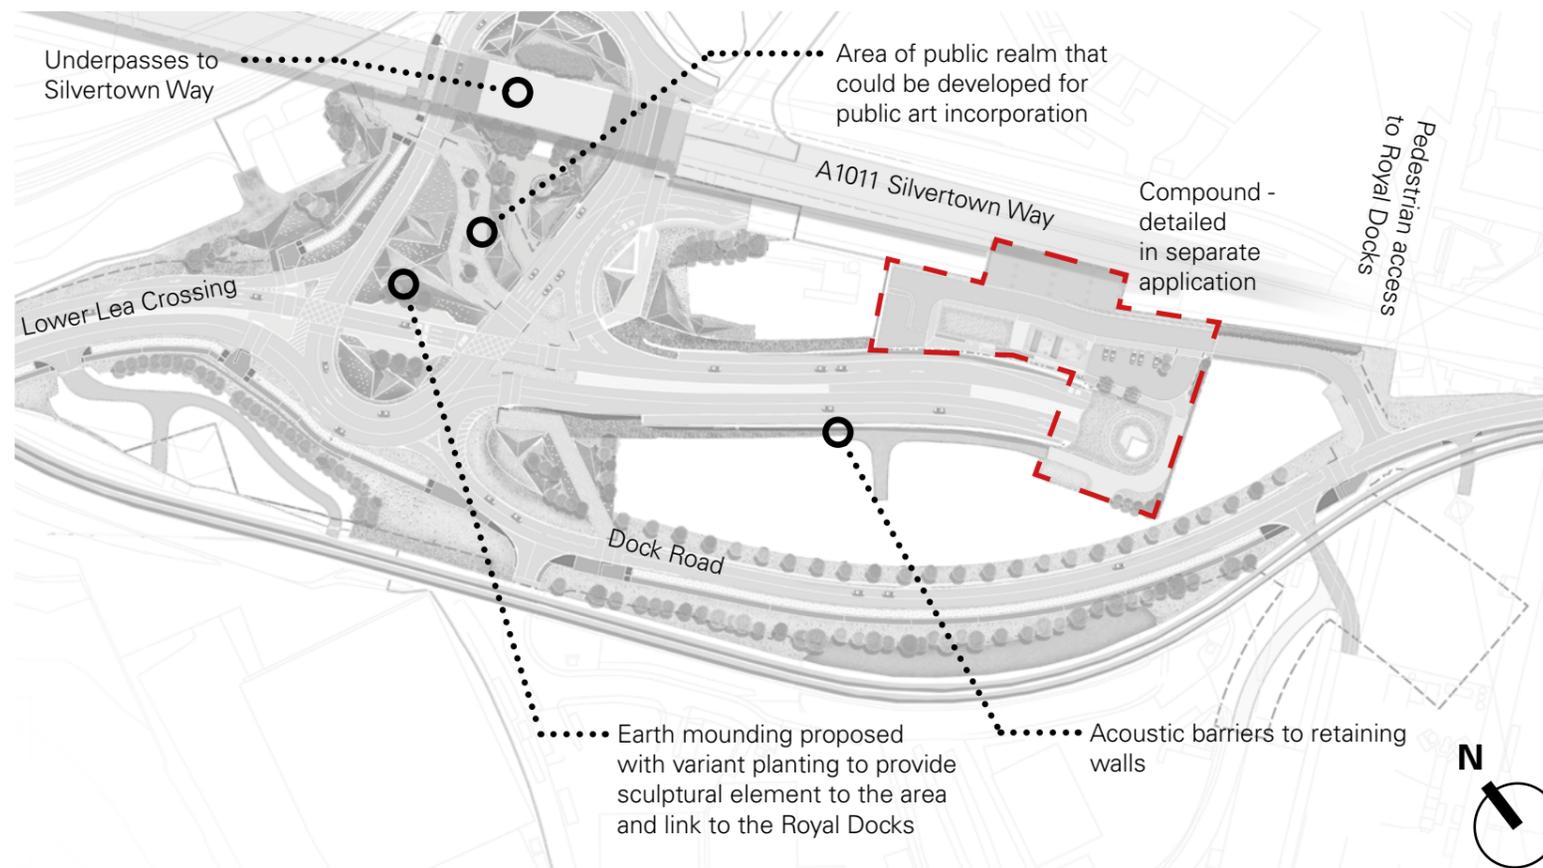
Rendered Plan demonstrating the sitting of green installations and locations for public art
